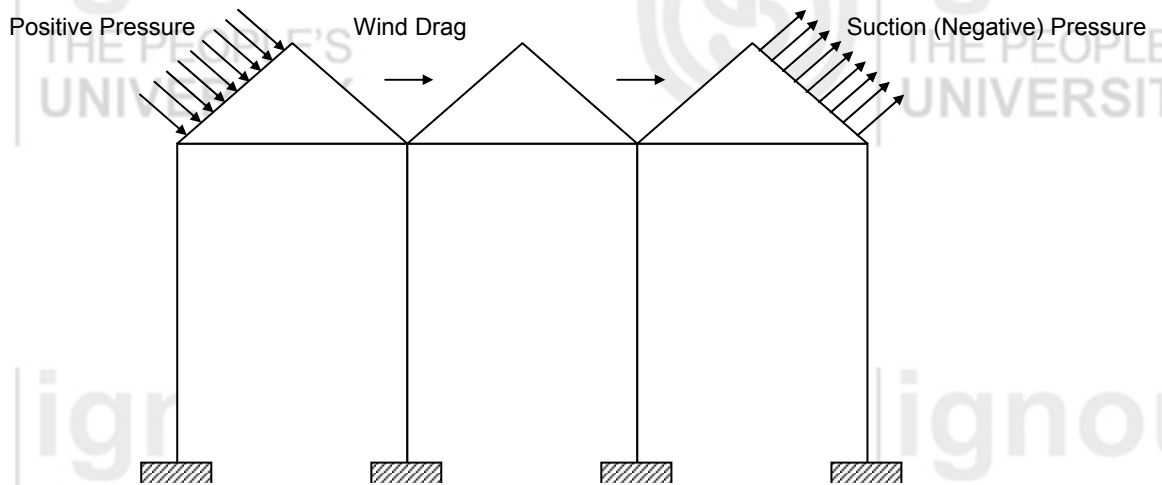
Negative and Positive Pressures on Roof Trusses
